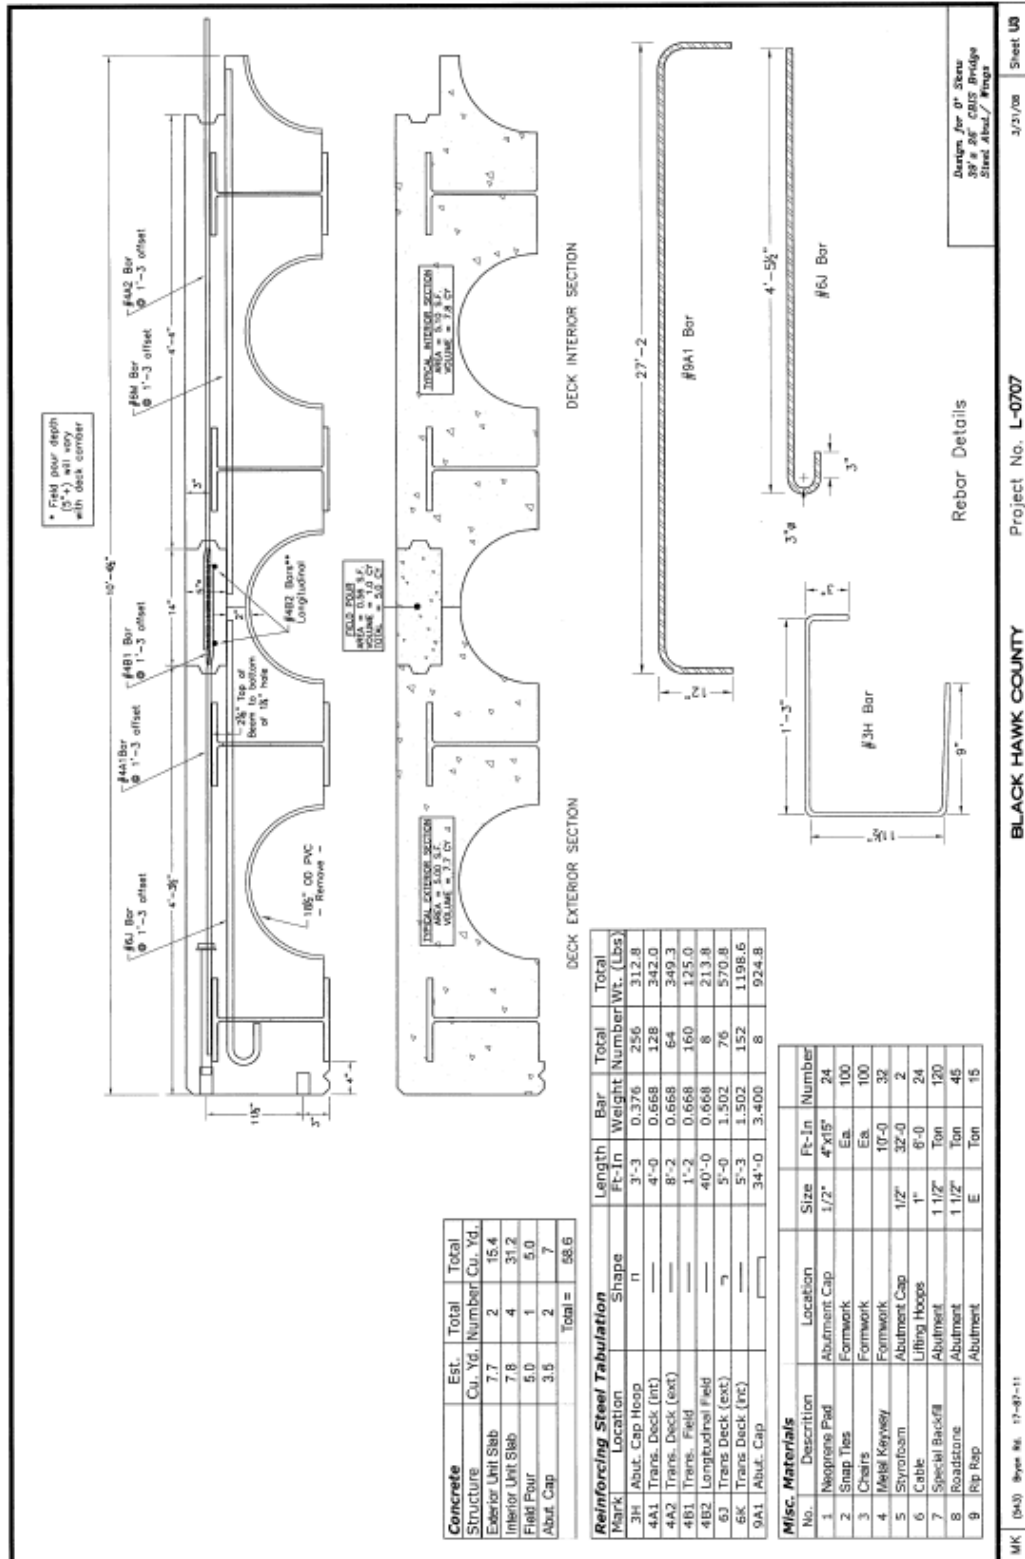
Section view and details of deck elements for demonstration project in BHC, Iowa
